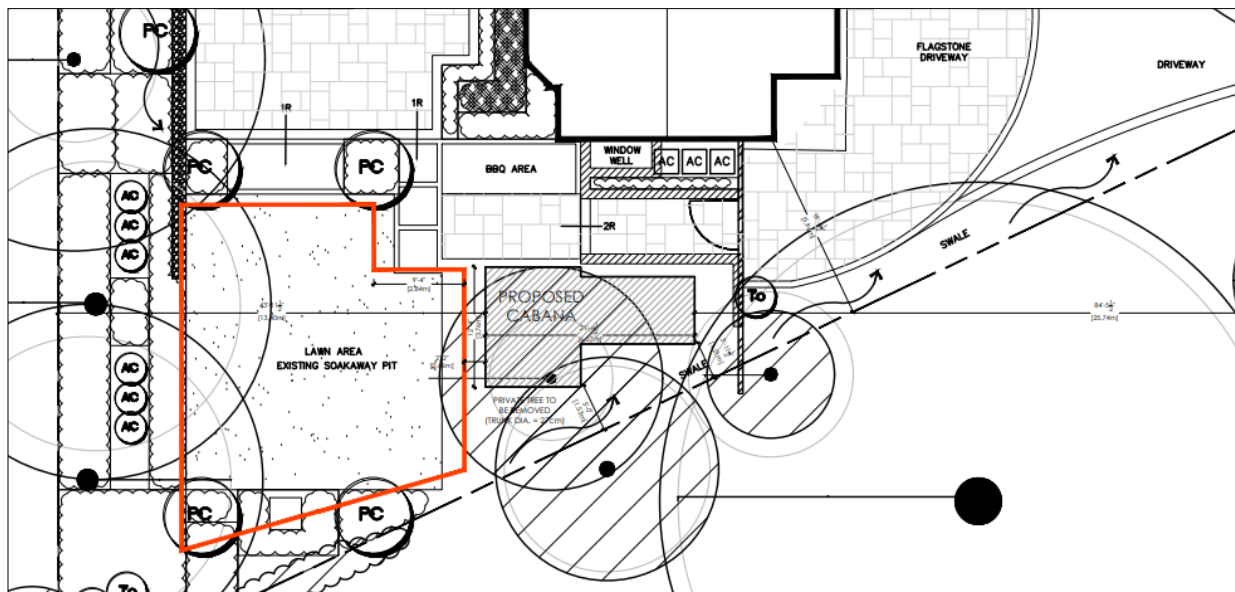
Excerpt of Tilford Cabana Site Plan for 190 Tilford Road
